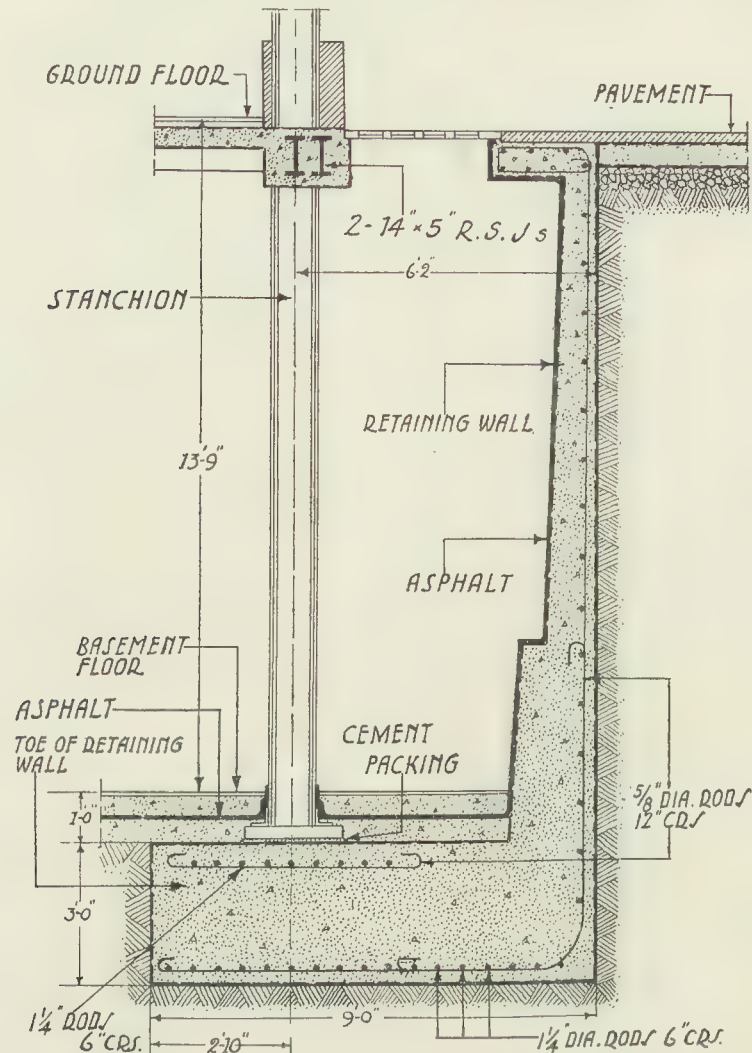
REINFORCED CONCRETE RETAINING WALL
